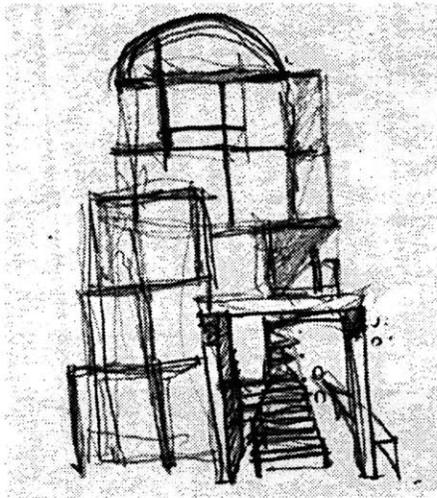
Sketch, looking as one approaches from Fanueil Hall.
